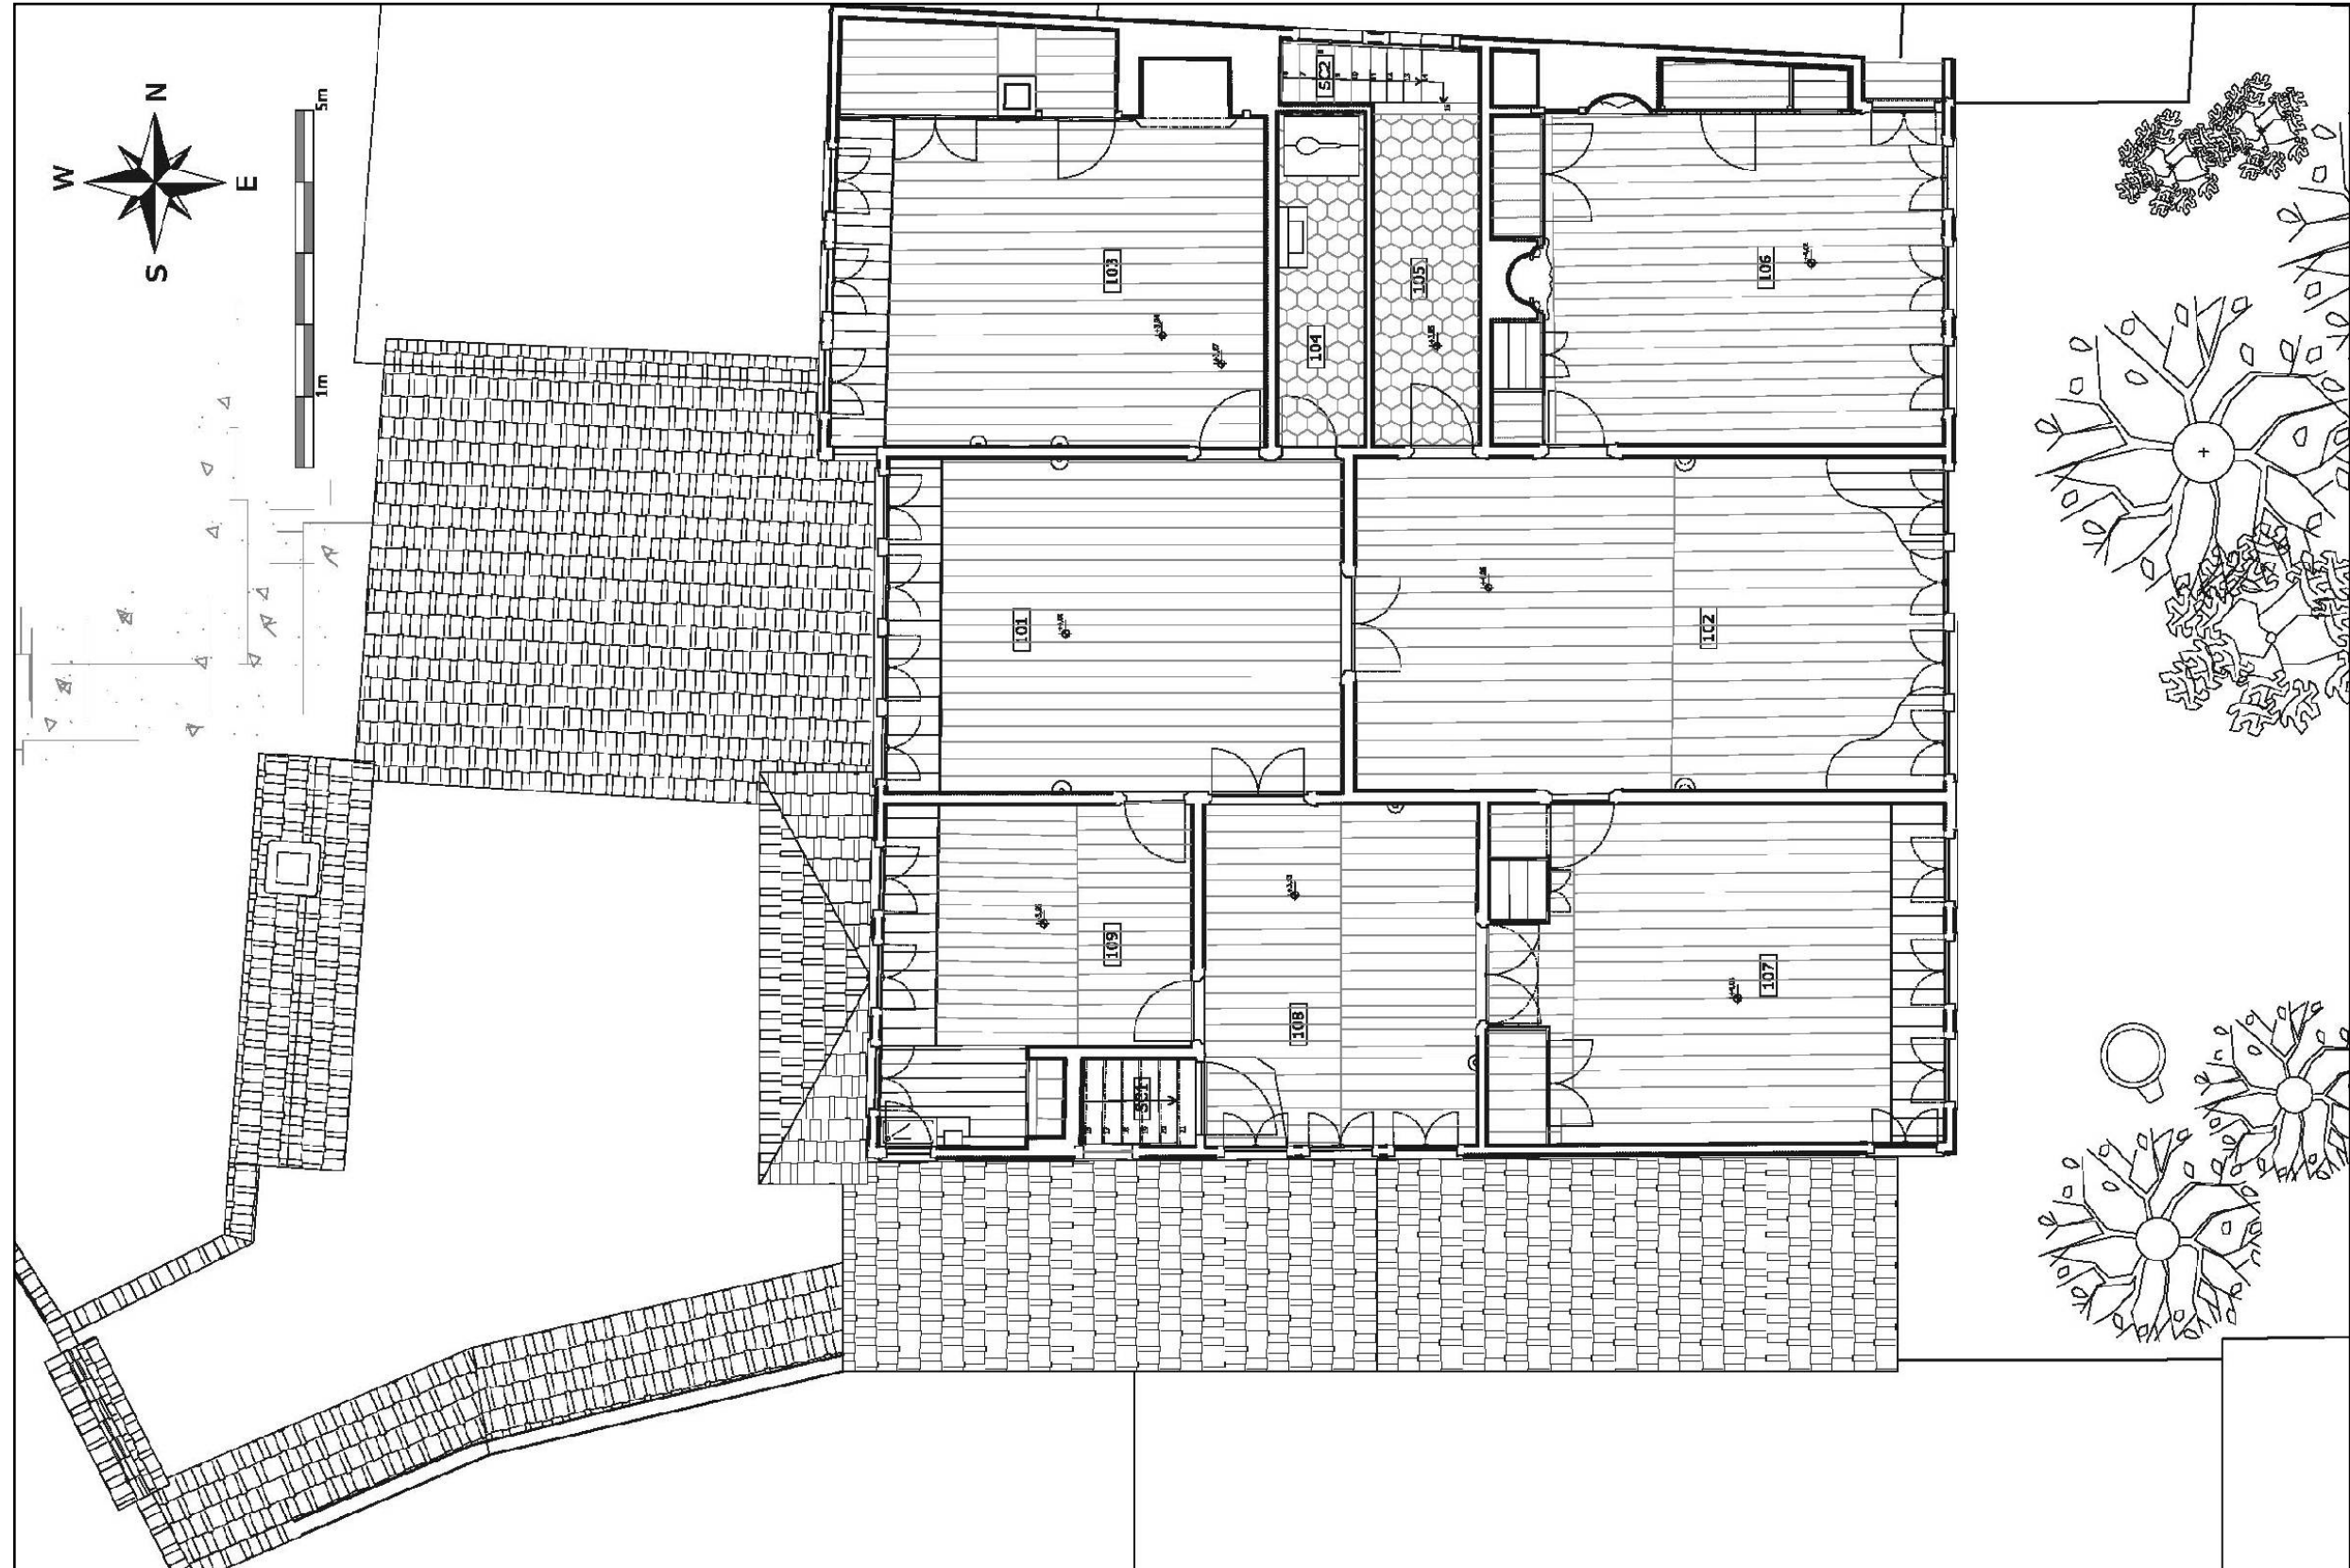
Restitution Phase II – First Floor Plan: 1/100 (Presented in 1/50 at July)
